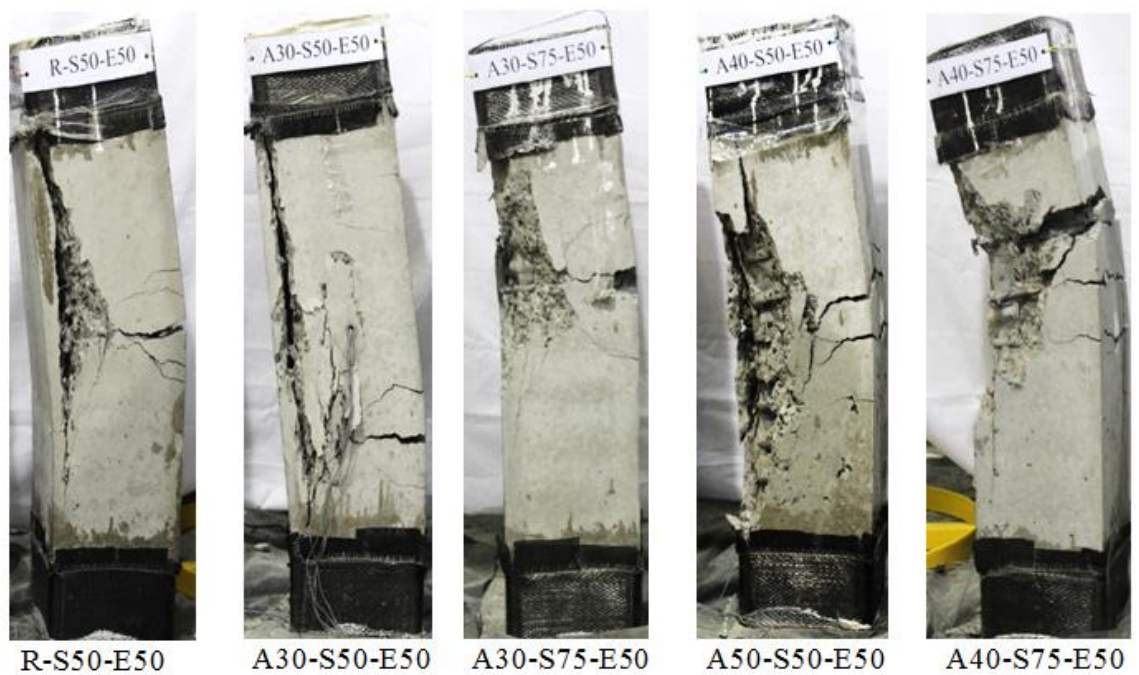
Behaviour of Specimens under 50 mm eccentric axial loads: Side view
